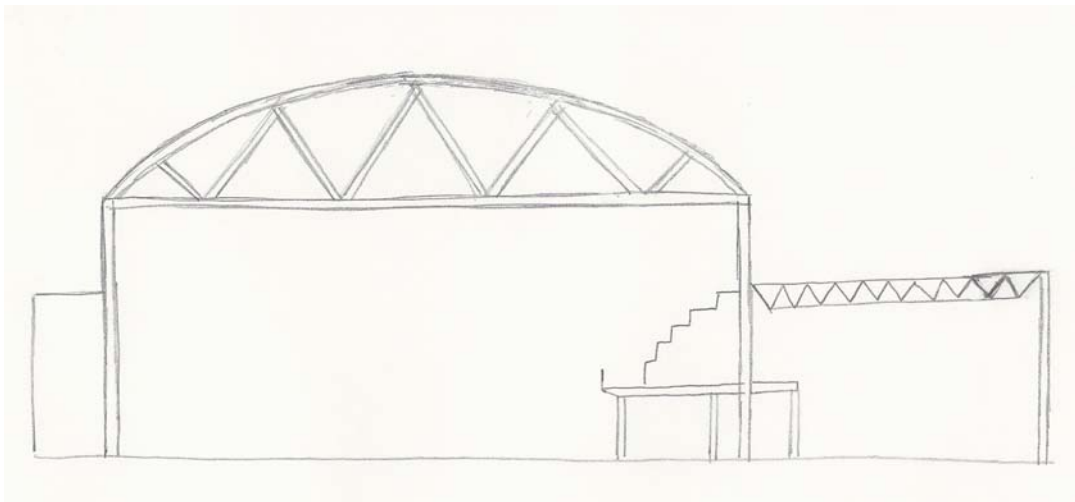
Preliminary Sketch of Potential Wood Truss Configuration
